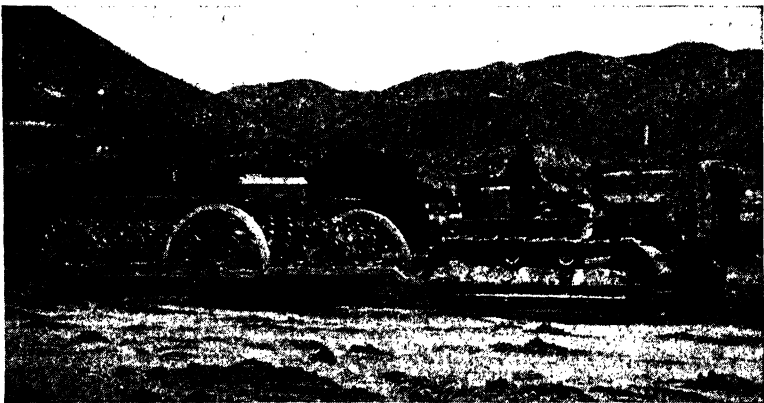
A sheep's-foot tamper compacting a fill.
